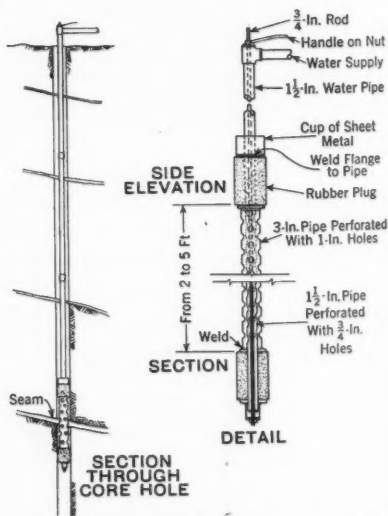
COMPRESSION-TYPE DOUBLE EXPANDER FOR WASHING SEAMS
